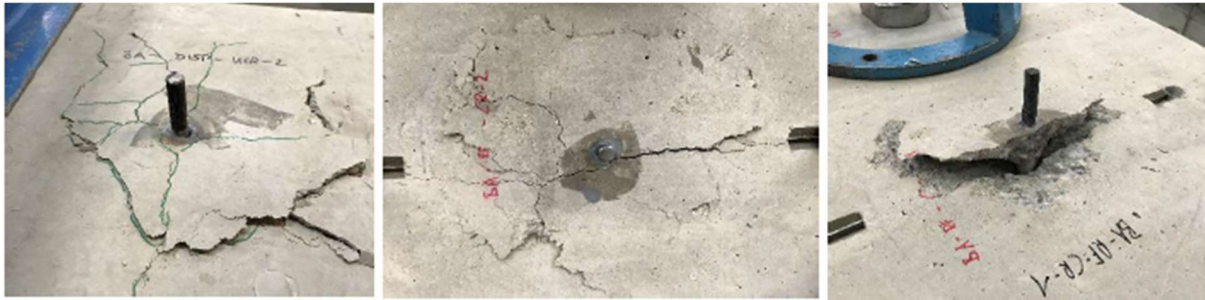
Typical failure modes of bonded anchors in uncracked and cracked concrete.
